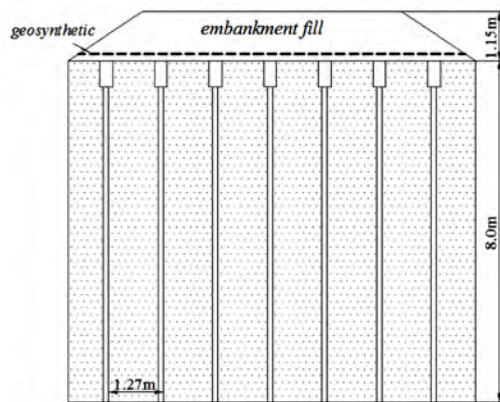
Layout of the embankment case for the Kyoto Road. Drawing modified after Van Eekelen et al., 2008 [6].
